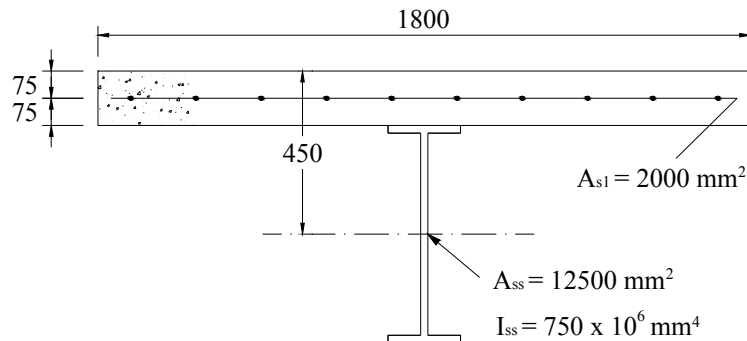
Cross-sectional details of the verification example (unit: mm; adapted from Gilbert 1989)
